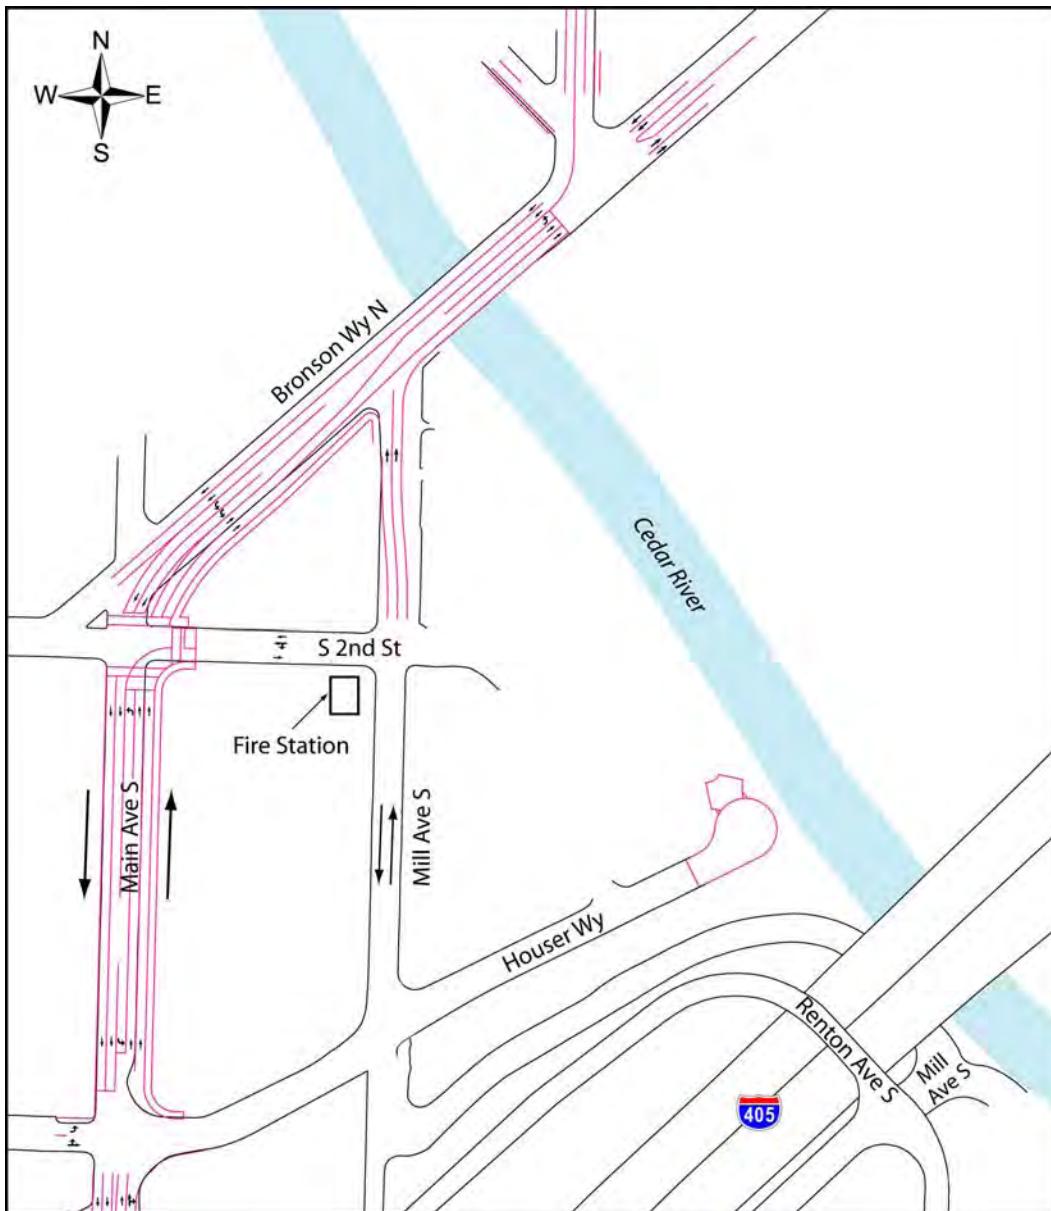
Mill Avenue Design Option for Local Access to Bronson Way
